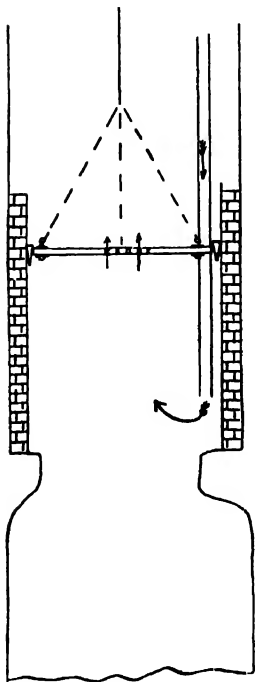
Platform or Cradle upon which men stand to build Shaft Walling. Also Air-pipe to ventilate underneath Cradle
